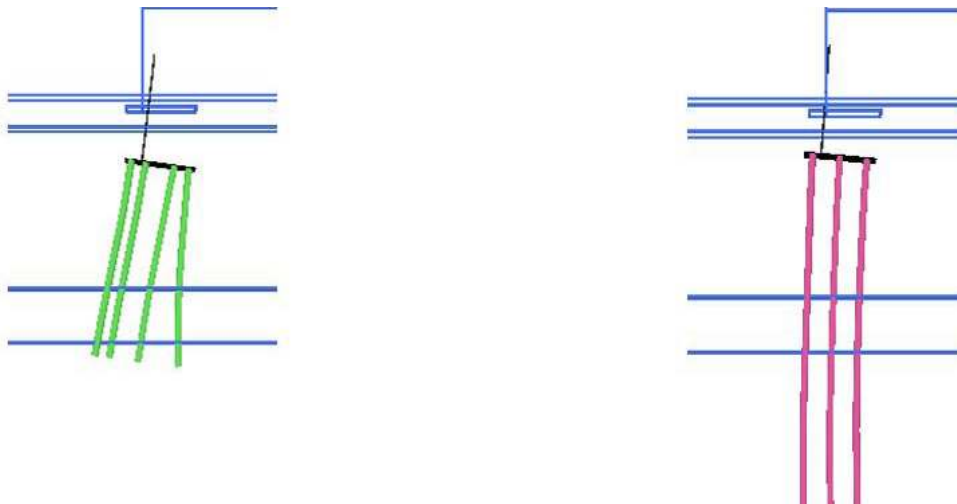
Behaviour of piles at loading from bridge beck. Left driven piles and right bored piles. Note the deformations of piles and mesh are scaled up.
